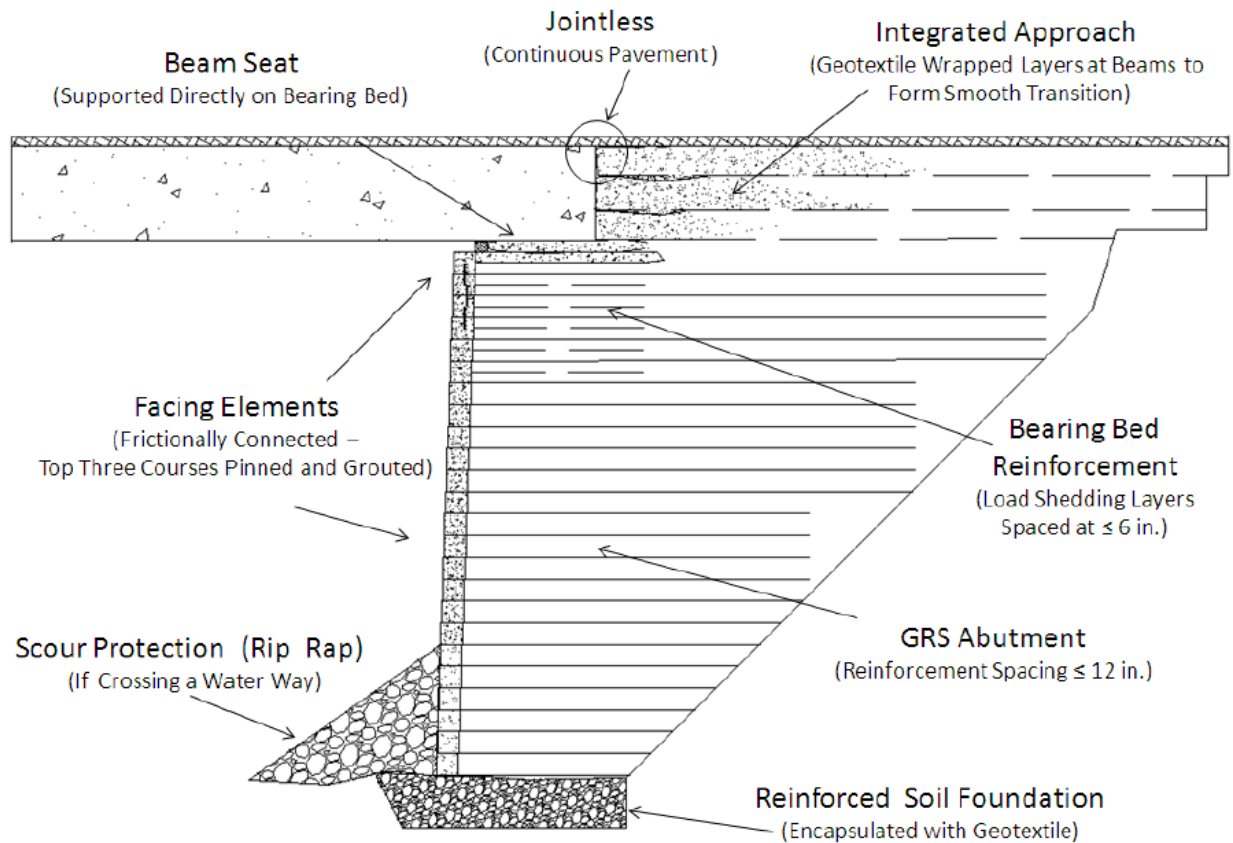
Typical GRS-IBS cross-section (Adams et al. 2011a)
